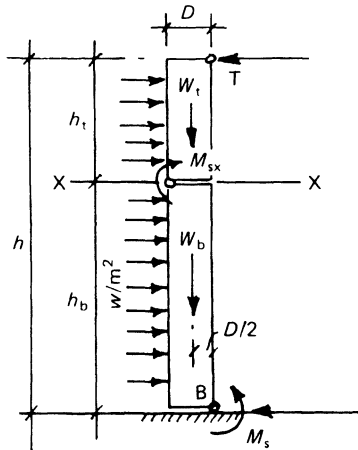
Propped cantilever masonry wall at ultimate limit level
